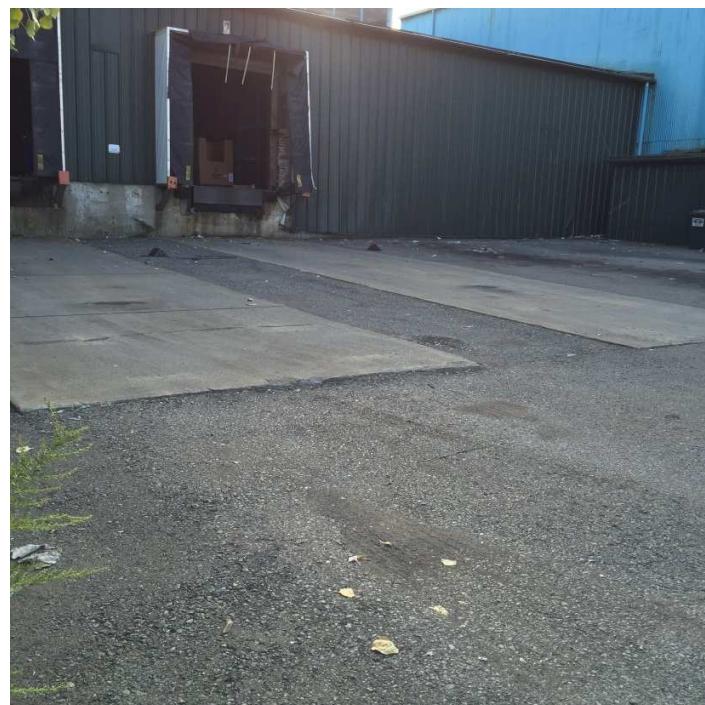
Building Apron Concrete System (north end of building) looking southeast.
